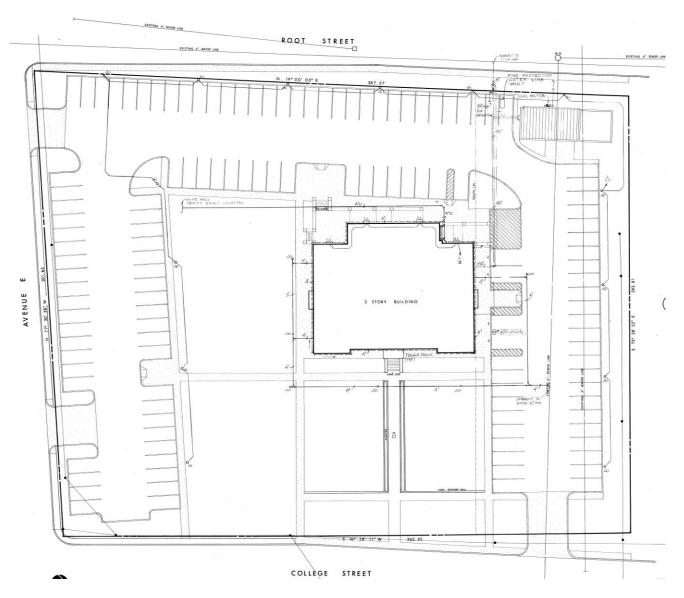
site plan, existing (Killis Almond & Assoc. 1993)
